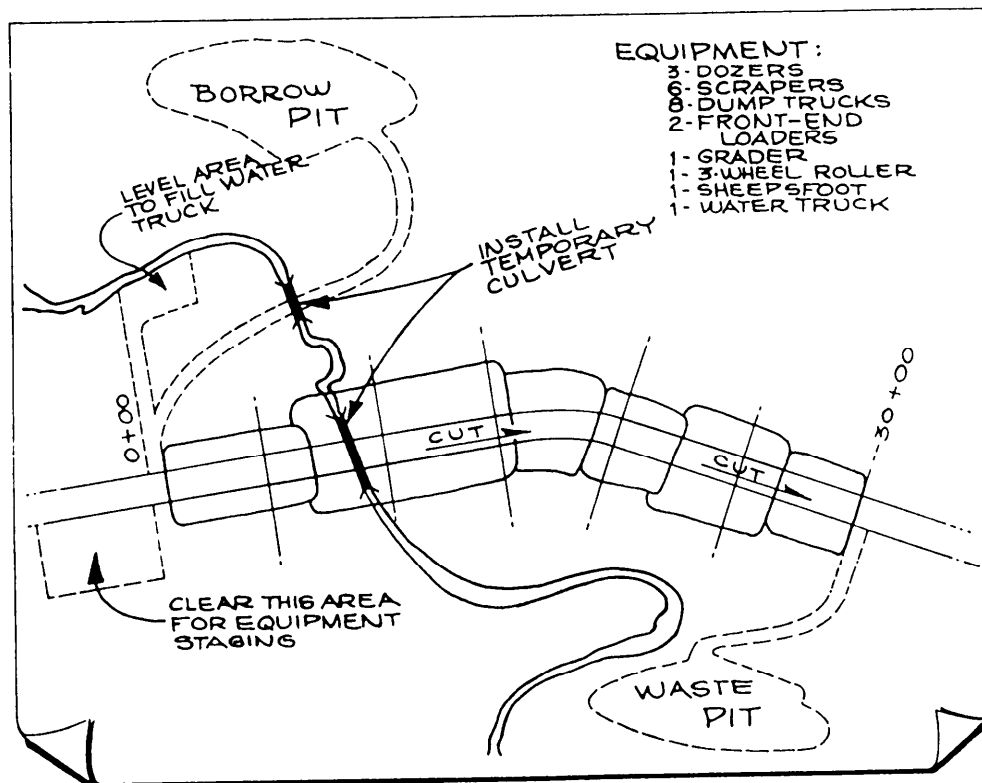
Overlay sketch, emphasizing temporary road and culvert.
